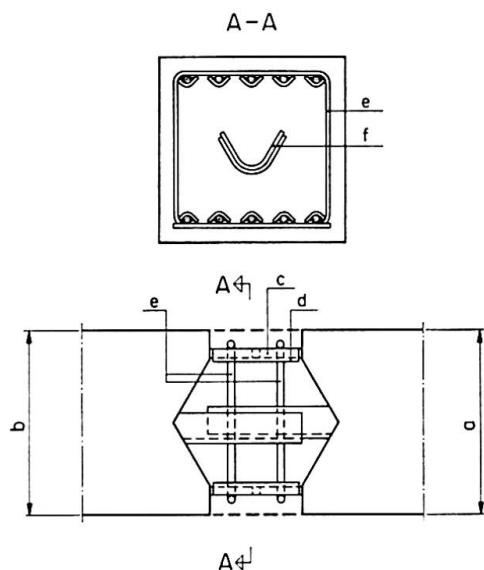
Joints made by using bent steel plates. The plate and the bars have the same centre joint and the jointing steel is not to be deformed, as shown in Fig. 6. Note the use of the supporting steel elements for keeping the concrete elements in place before welding.
